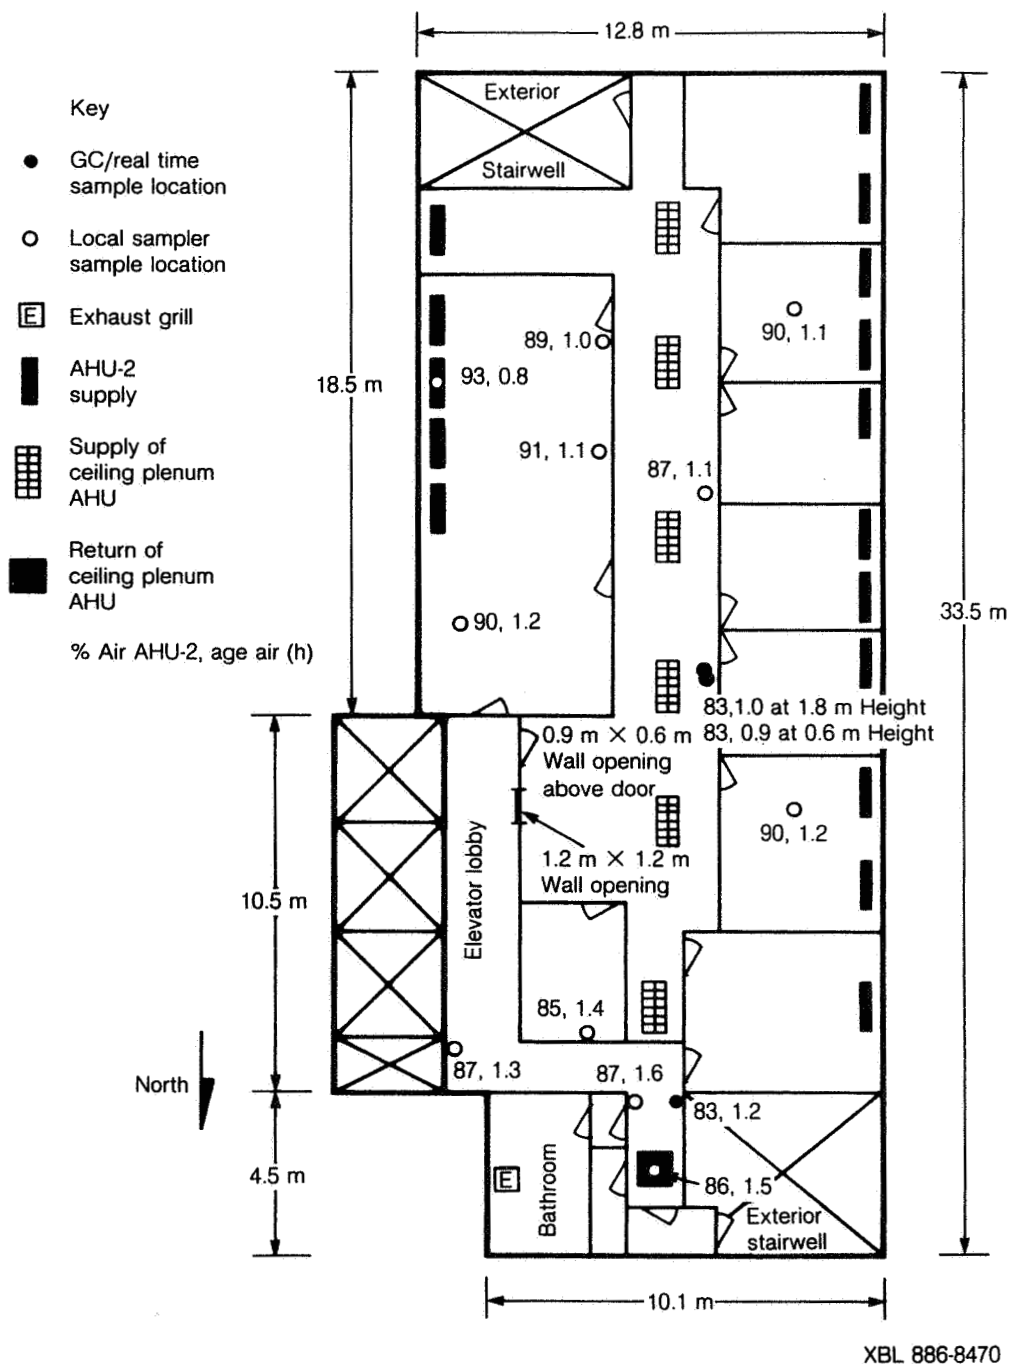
Plan view of sixth floor of Building A showing the fractions and ages of air supplied by AHU2.
